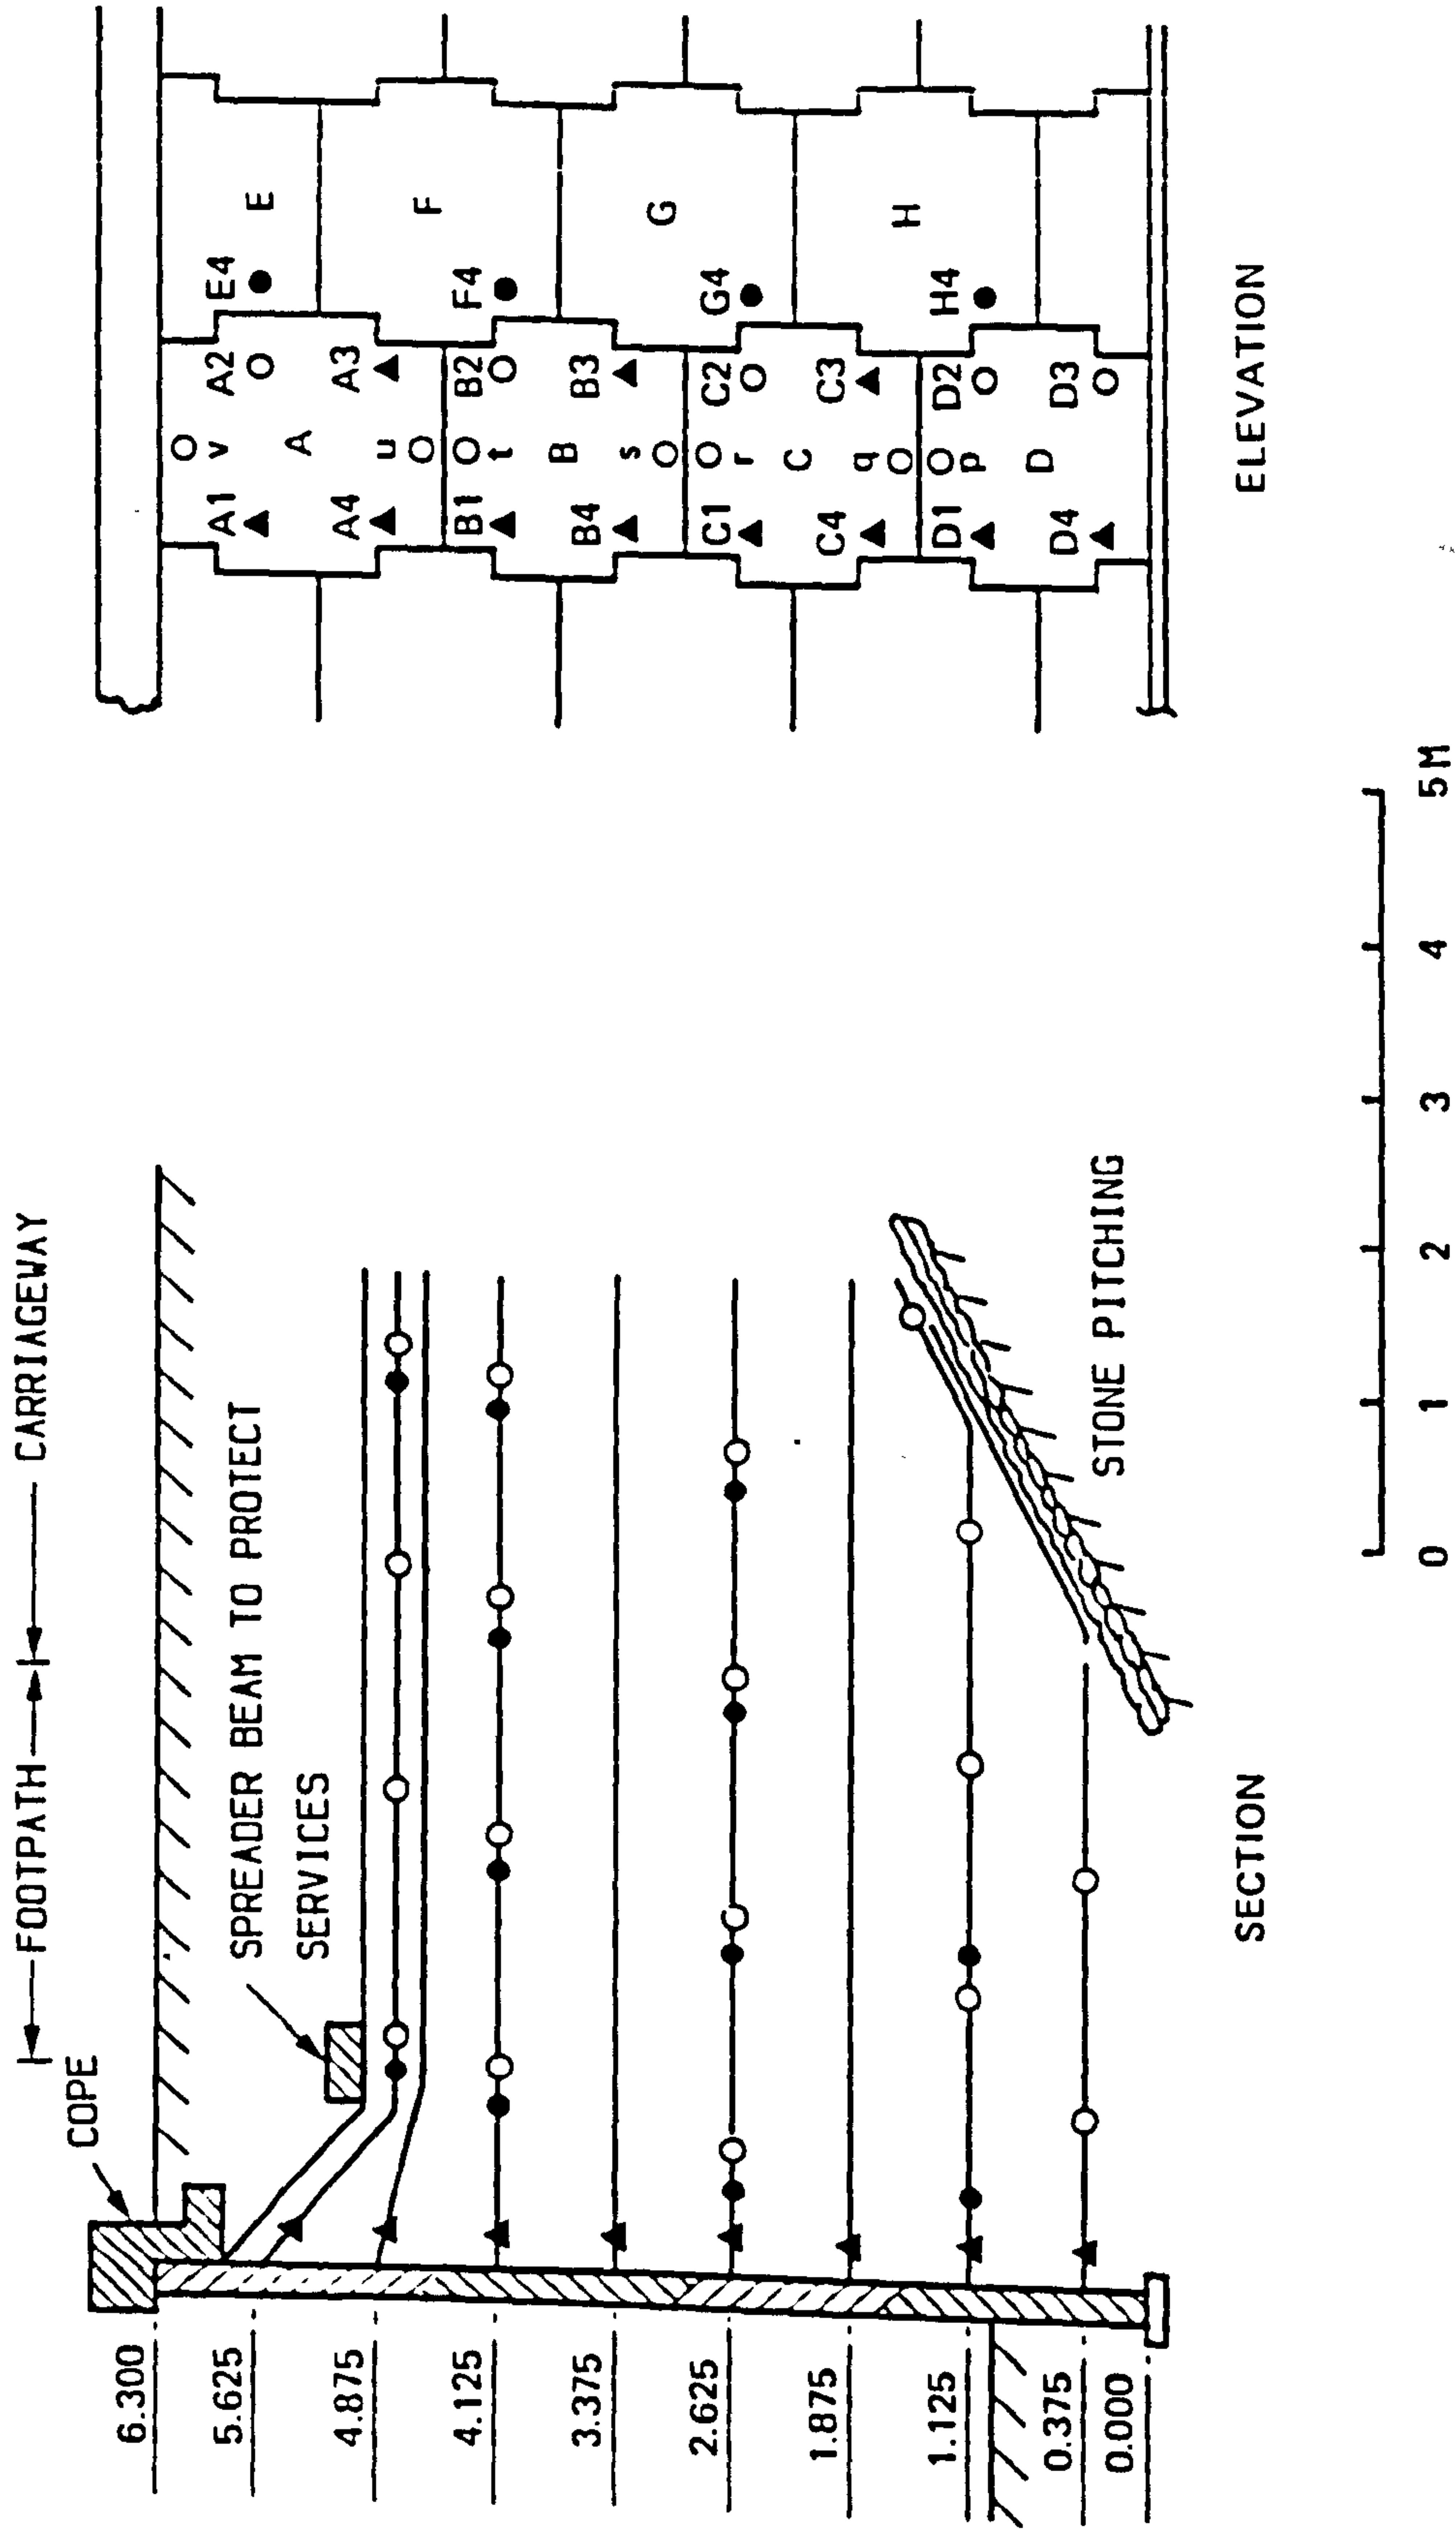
LAYOUT OF GAUGED STRIPS (AFTER FINLAY, 1977).
